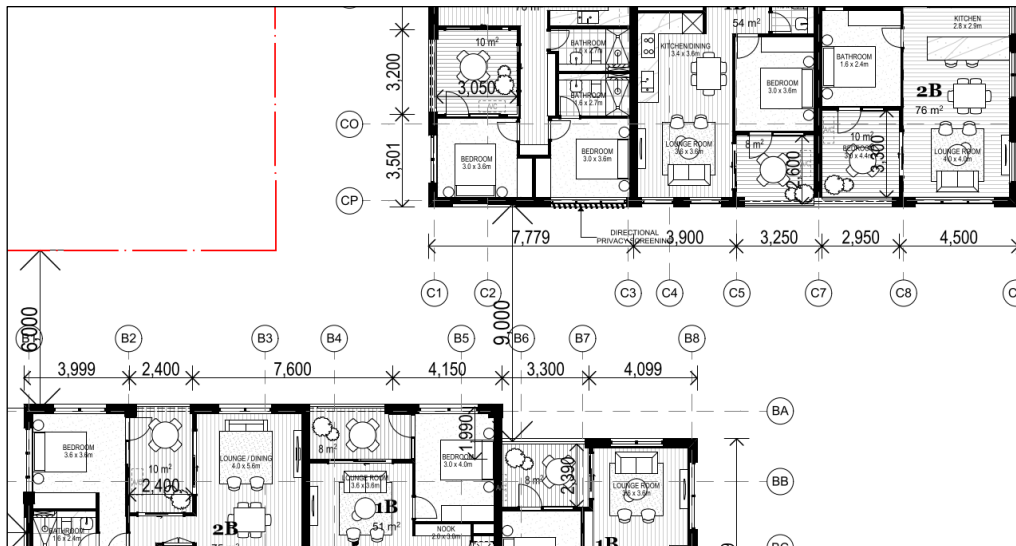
Building separation at level 1-3 (2nd to 4th storey) – 12m required.
